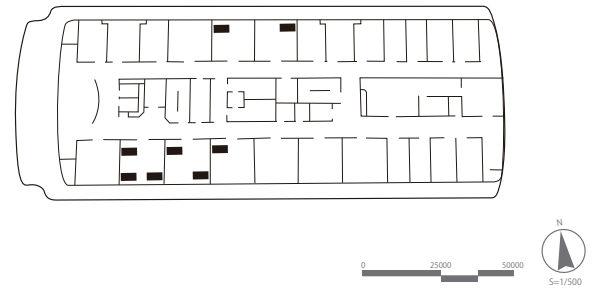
A floor plan and bed position of the subjects of Hospital B (Floor4)
